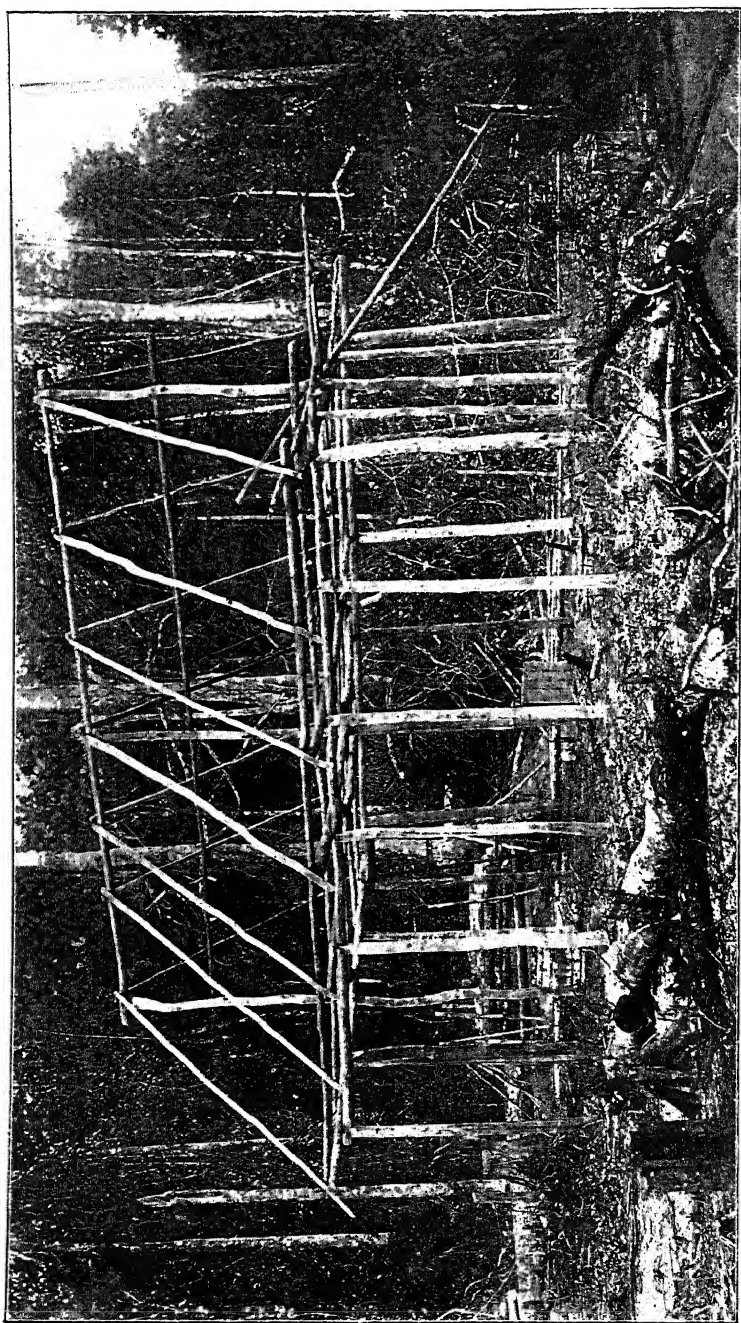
NATIVE FRAMEWORK, CONSTRUCTION OF BUILDING, FRENCH GUIANA.
